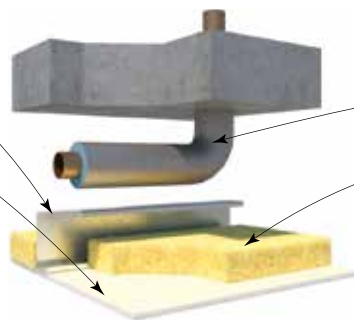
WALL/CEILING SYSTEMS FOR WASTE PIPE IN CEILING – WITH WALL LINED ONE SIDE
